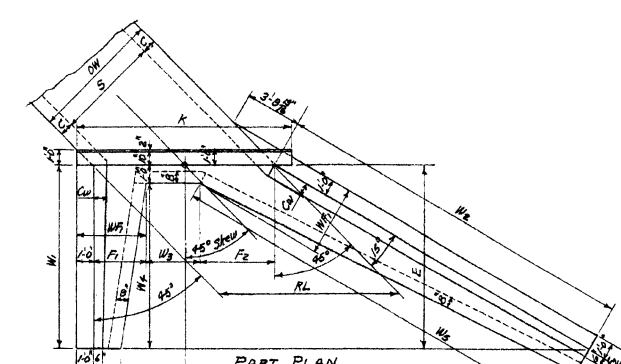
DETAILS AT TOP OF WINGS - 45° SKEW RIGHT FORWARD
